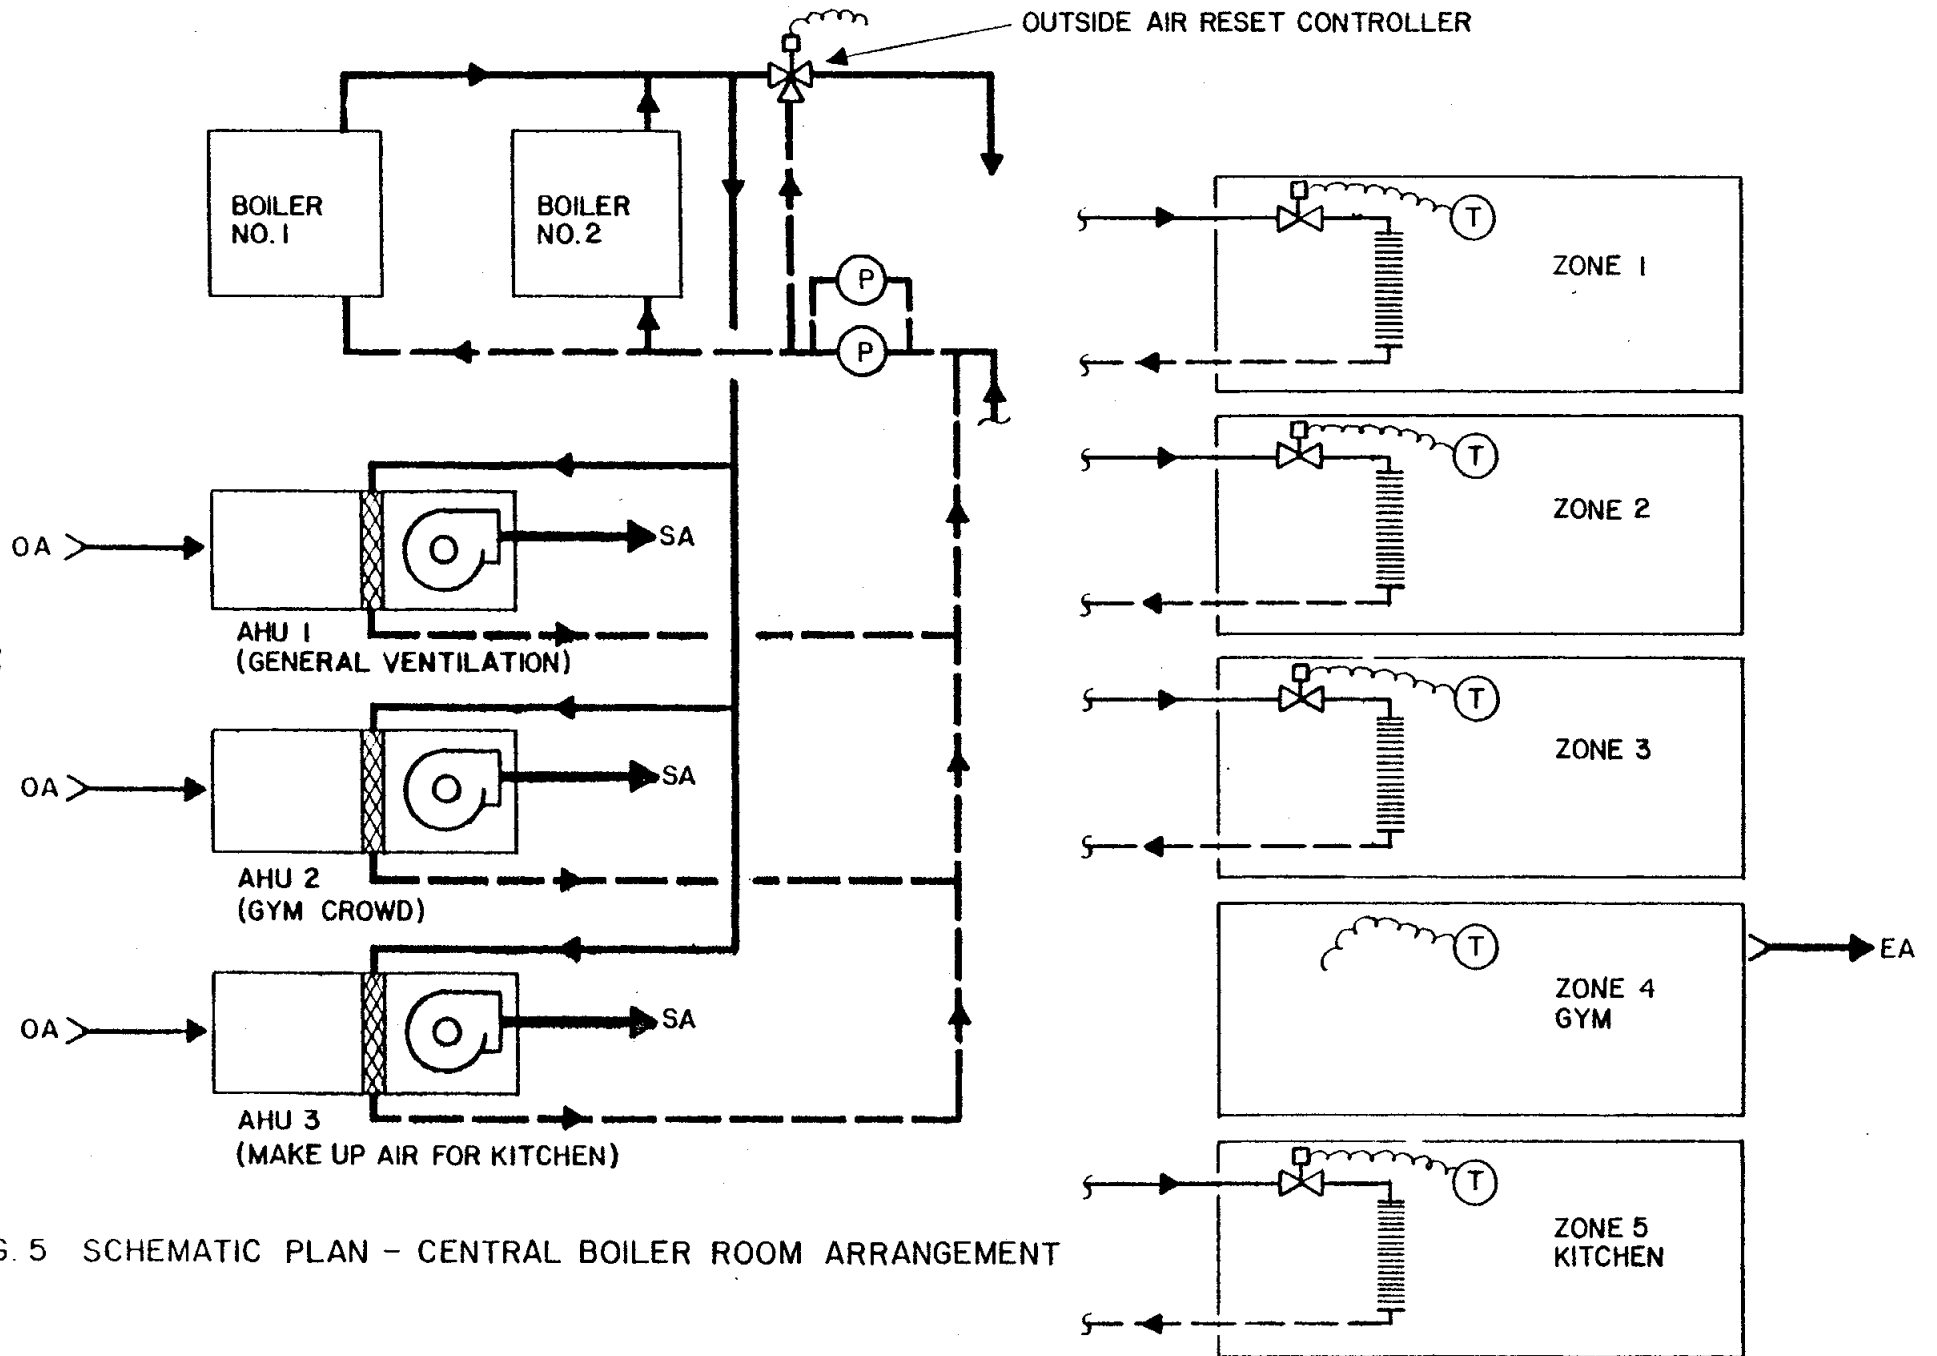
SCHEMATIC PLAN - CENTRAL BOILER ROOM ARRANGEMENT
